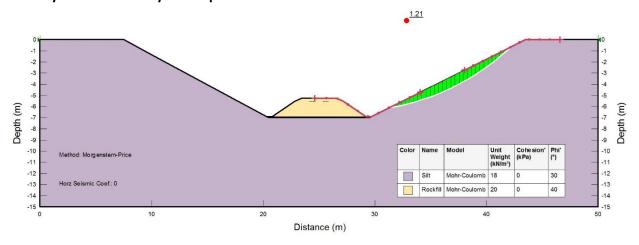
Slope stability of silt soil, 7 m cut. Min FOS = 1.2 (See Note)
